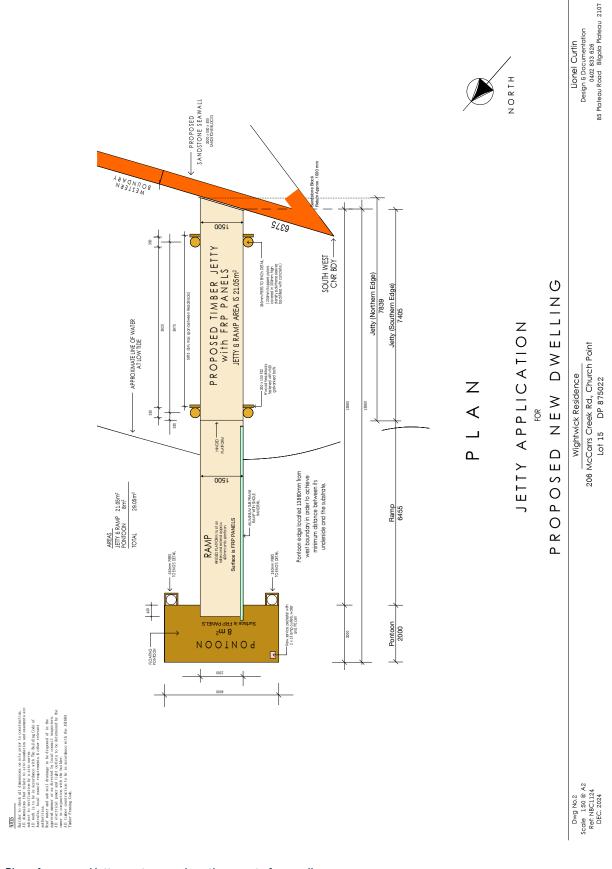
Plan of proposed jetty, pontoon and southern part of seawall
